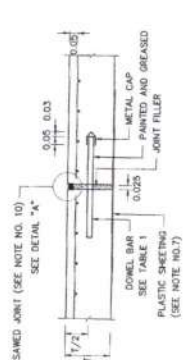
DETAIL OF BROOM SURFACE CONCRETE PAVEMENT
